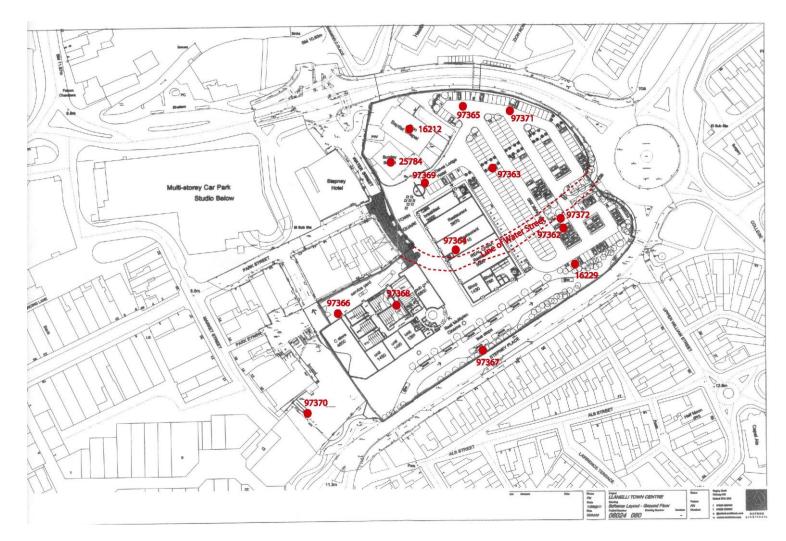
Plan of development site overlaid with locations of archaeological sites (in red). Plan created by Oxford Architects for Henry Davidson Developments, provided by Asbri Planning. Plan not to original scale.
